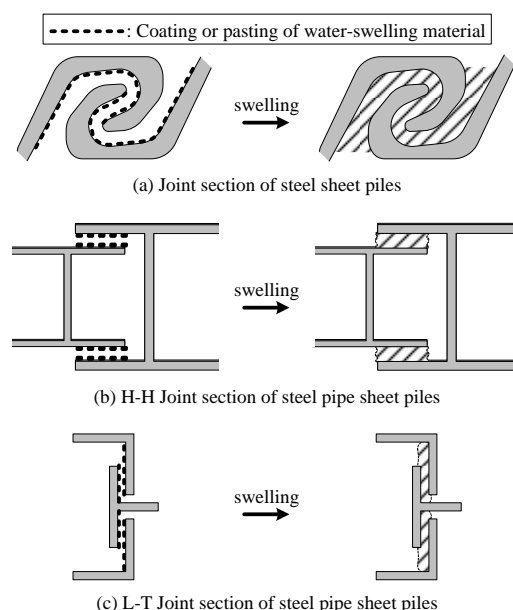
Water cut-off treatment on joint section of steel sheet piles or steel pipe sheet using water swelling materials
